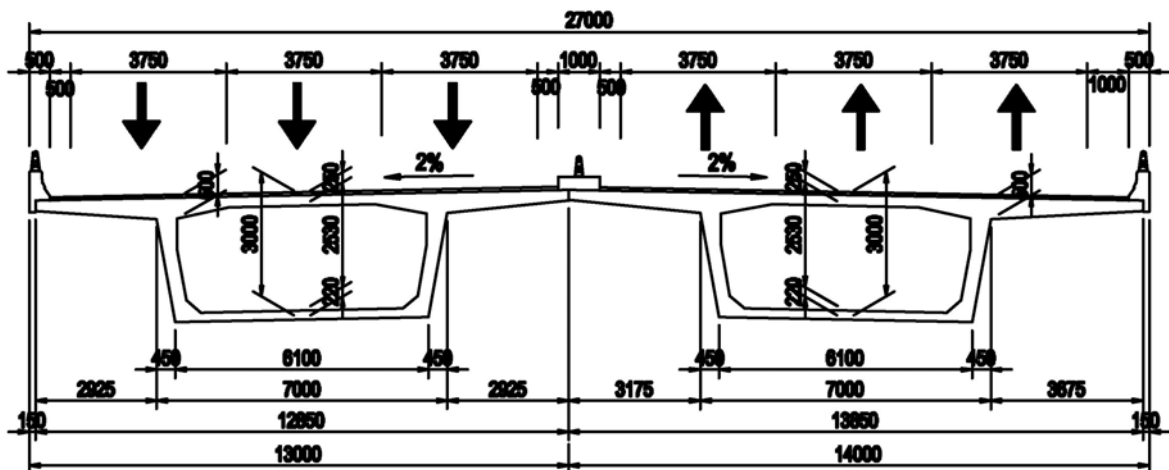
Typical Cross Sections of Alternative (1), Case 4-3.0
